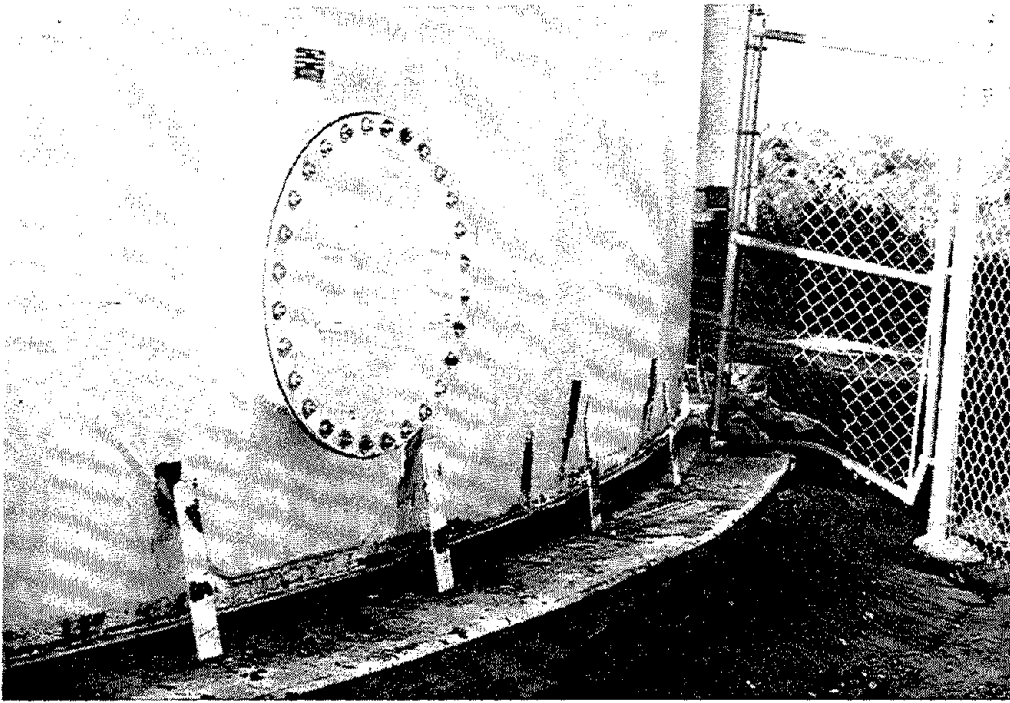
Opposite side of tank shown in Fig. 4.2. Welds at anchor straps failed. (T. Cooper)
